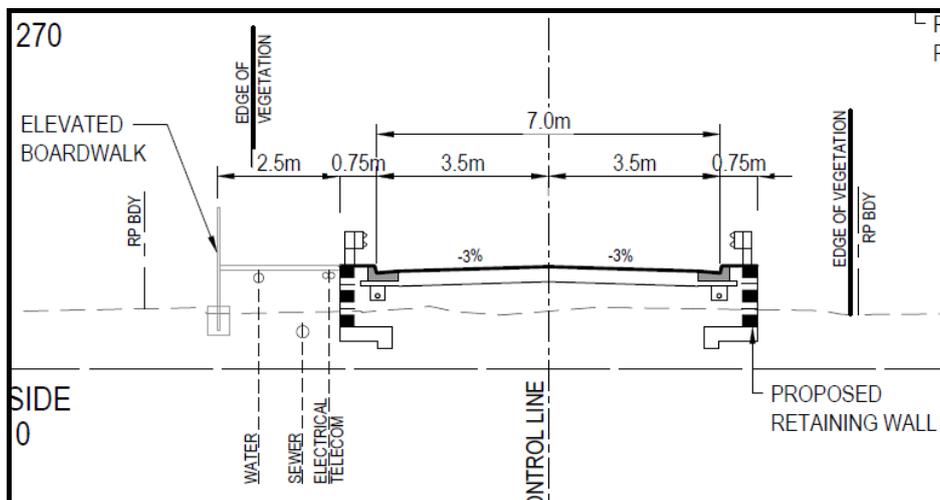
Road No 5 Cross Section (Source: Drawing C140 Arcadis 18 July 2019)
